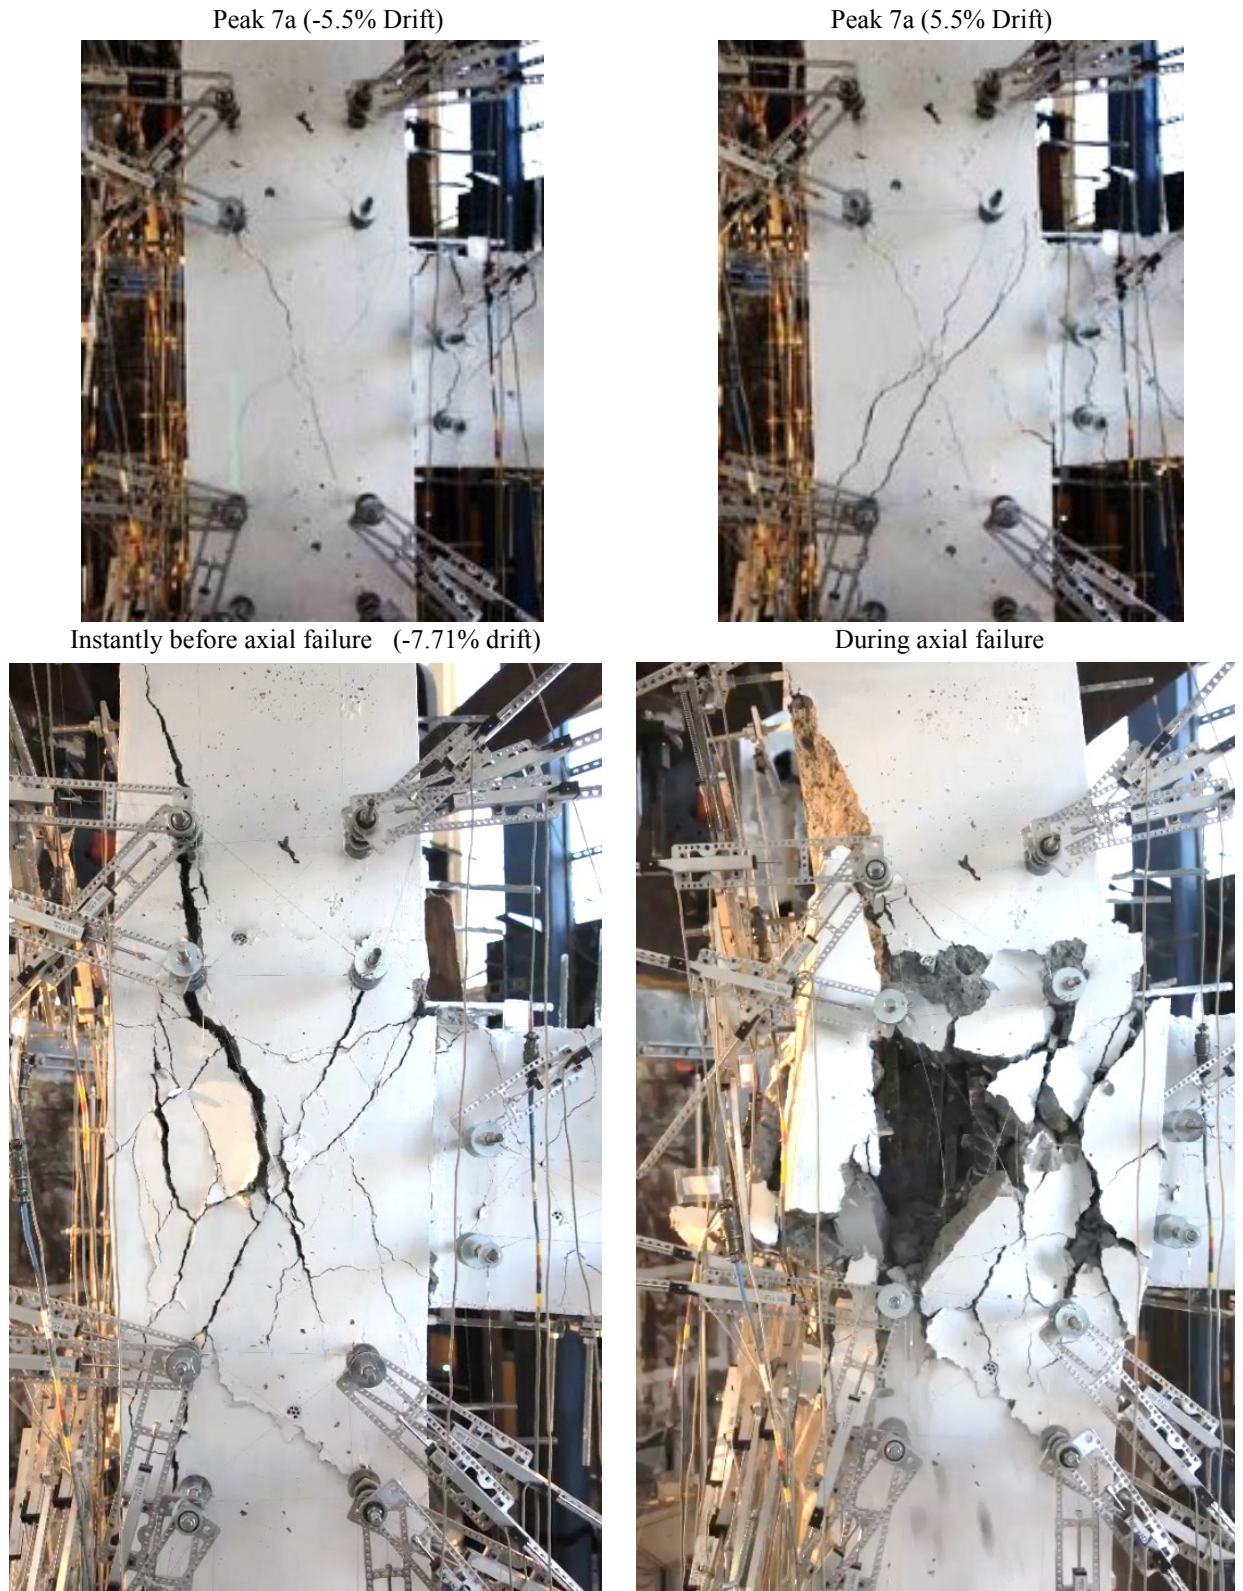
(Continued) North joint face crack development and joint distress at first peaks in specimen U-BJ-1
